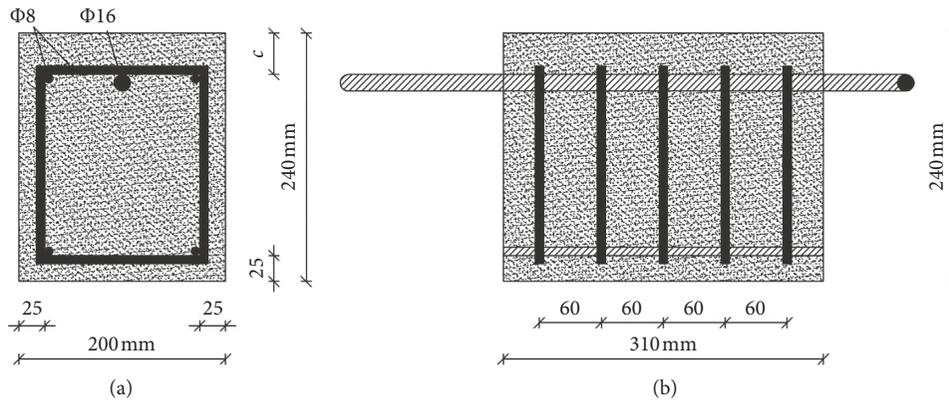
(a) Typical cross-sectional view (cover thickness, c); (b) typical longitudinal view (stirrups $\Phi 8/60$ mm).
